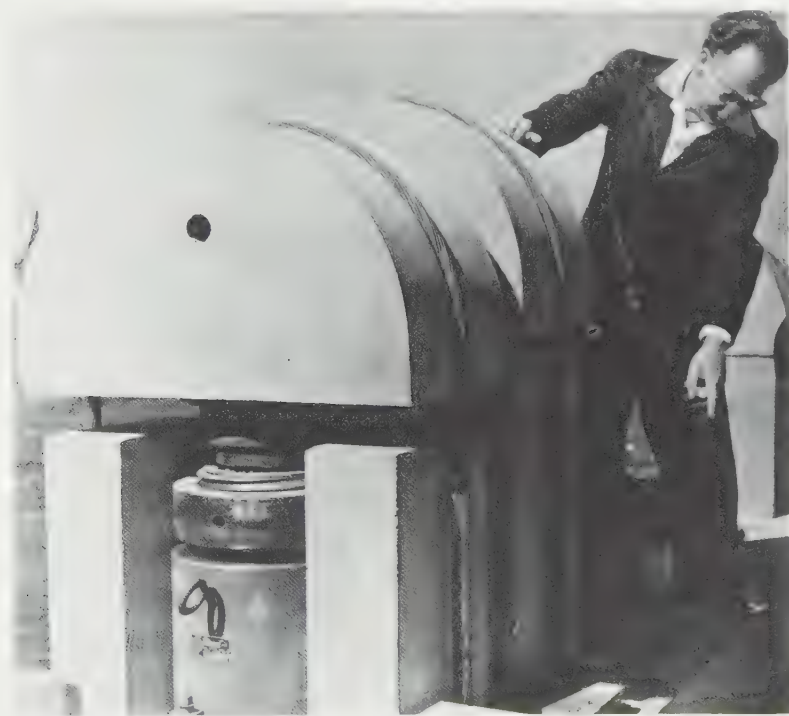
Prestressing heads and jacks used at Steenbras Dam (South Africa, 1955).
